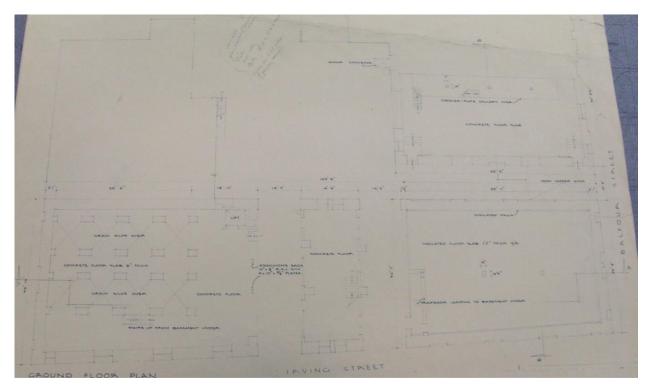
Plan drawings showing windows of Irving Street Brewery buildings: Ground floor plan by Lemont Niblett and Daubney, Drawing No. 4E-852A dated 27-07-54
